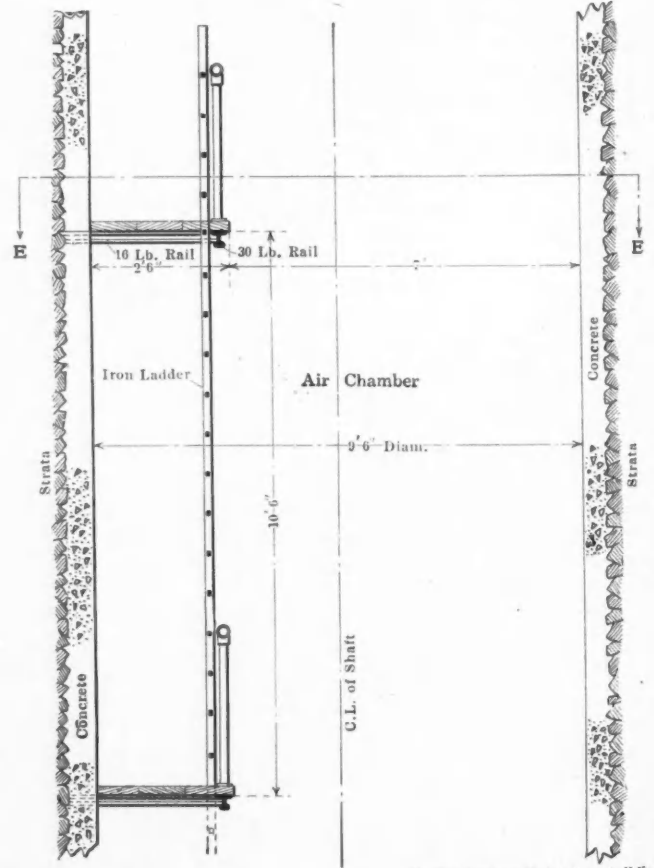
SECTION HH SHOWING PLATFORM AND LADDERWAY
